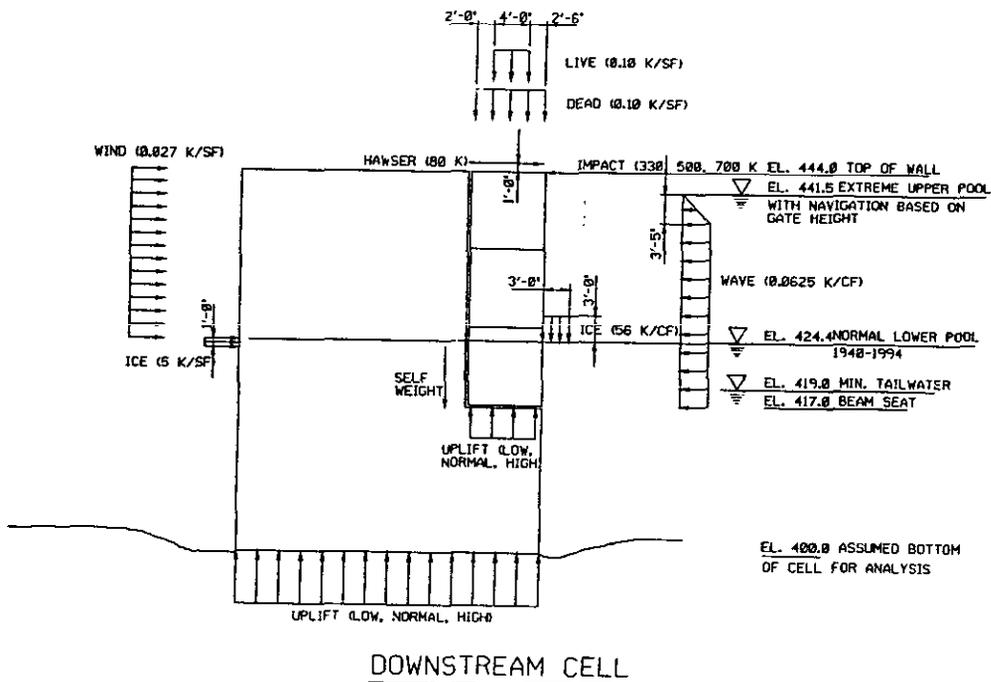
Typical Section Through Upper Guide Wall Extension for Lock No.22 With Loads and Water Elevations
